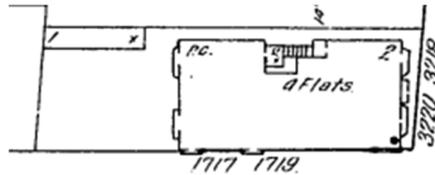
Site plans of 3218 Ellis Street in 1911. North is up.
